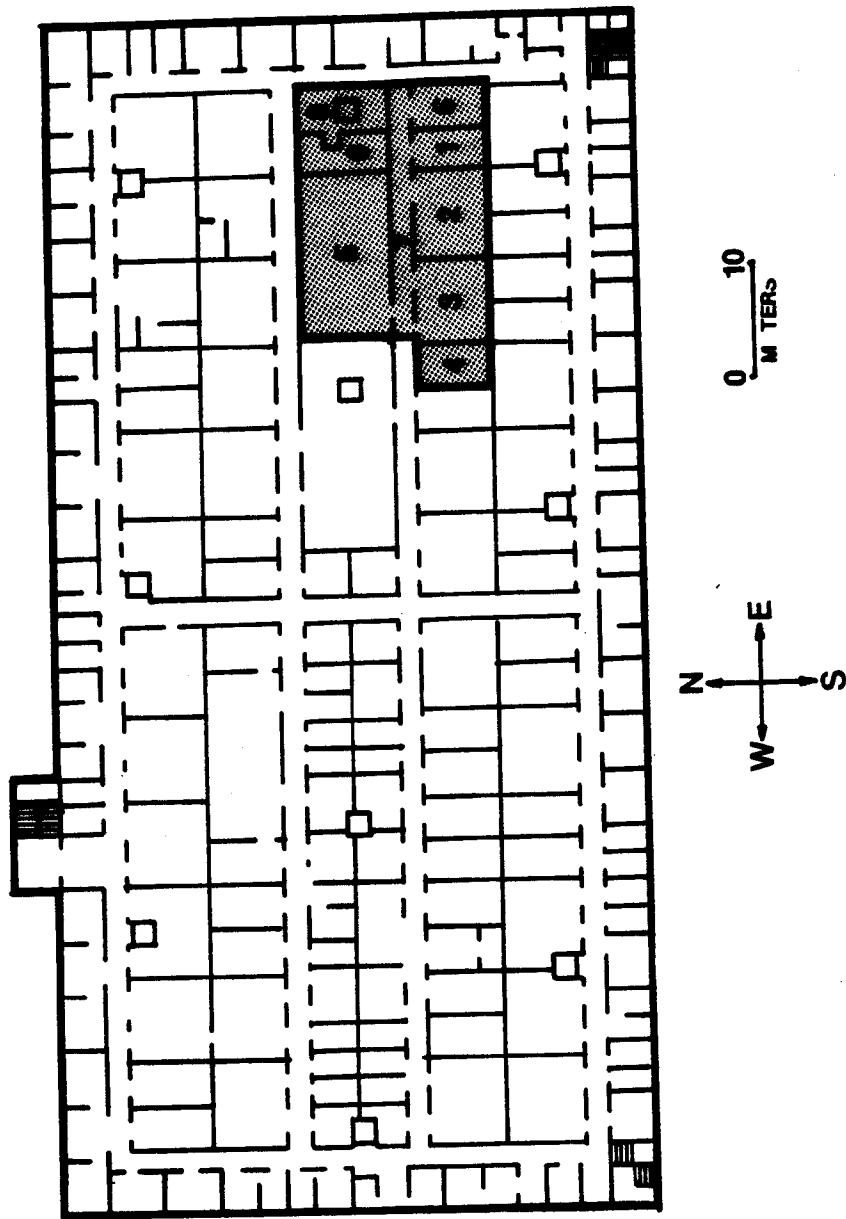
Building 004 Second Floor Plan Indicating Location of Hot Chemistry Area (1-9).
